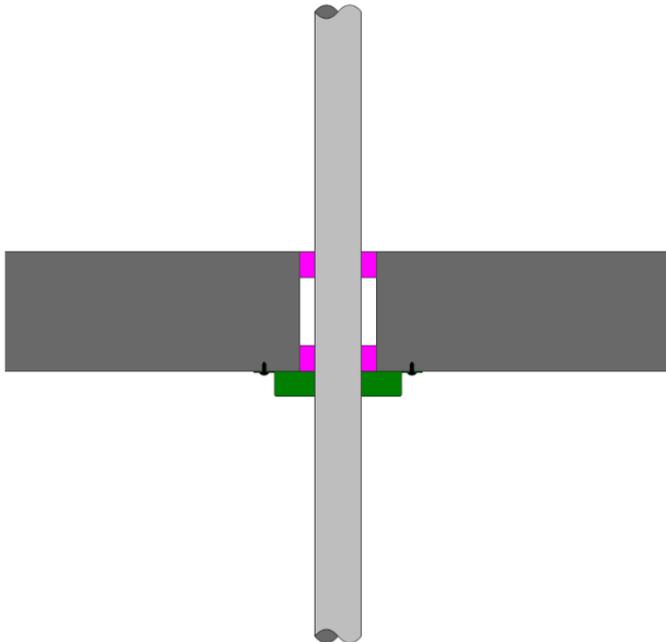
Typical installation of oversized BOSS MaxiCollar™ in floors
